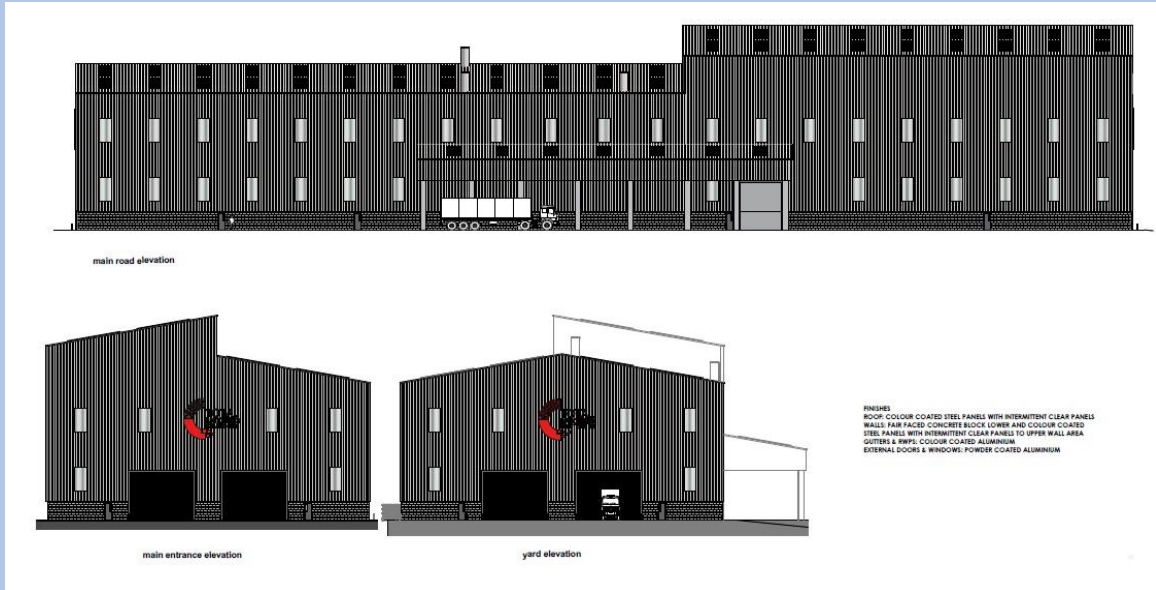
Zone 2 & 3. Factory main elevations (Image not to scale).
